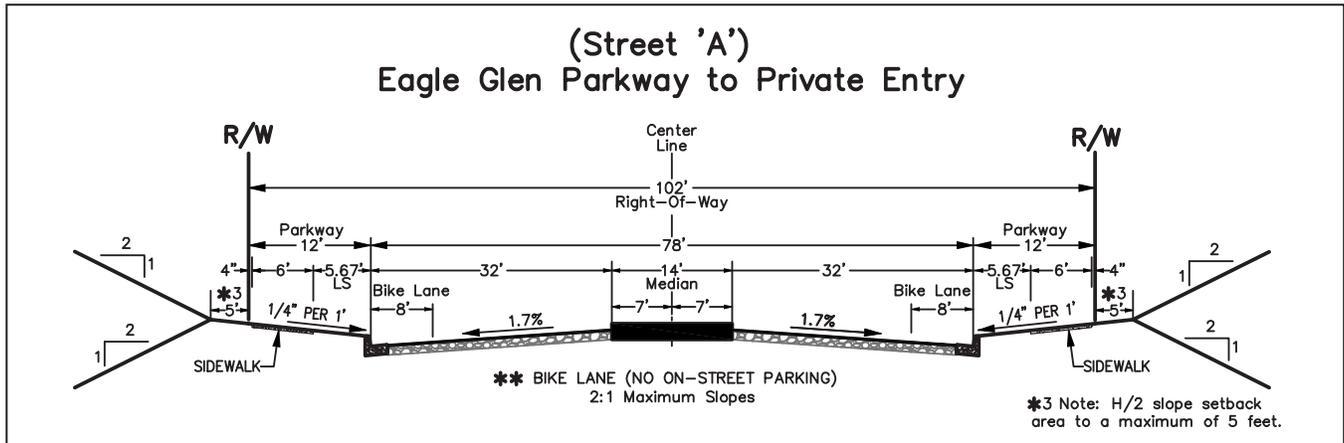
, Typical Street Cross Section - 76'-102' Transition Modified Divided Collector
